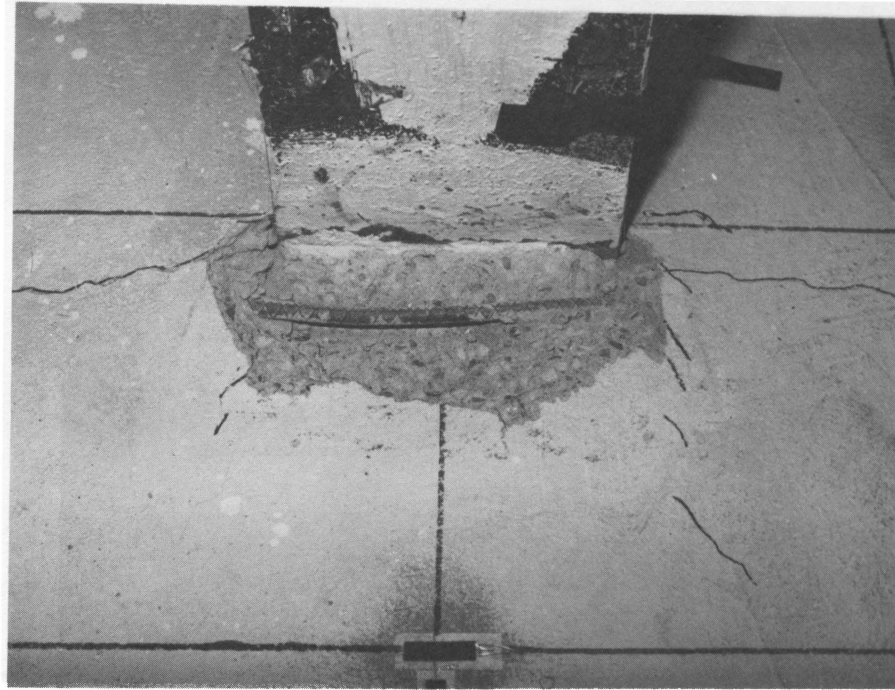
Failure Surface on Leeward Side of Center Column of CA-2
